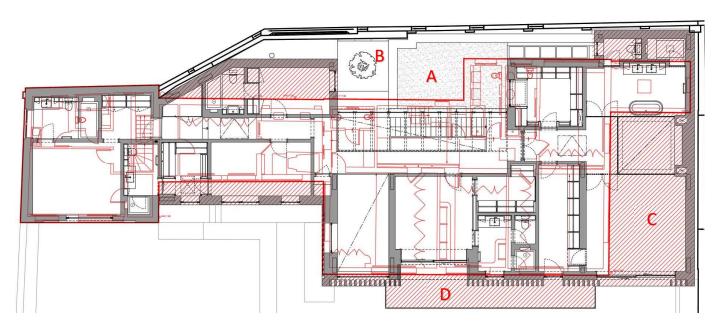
First Floor plan: existing plan in red, proposed new areas in red hatch
